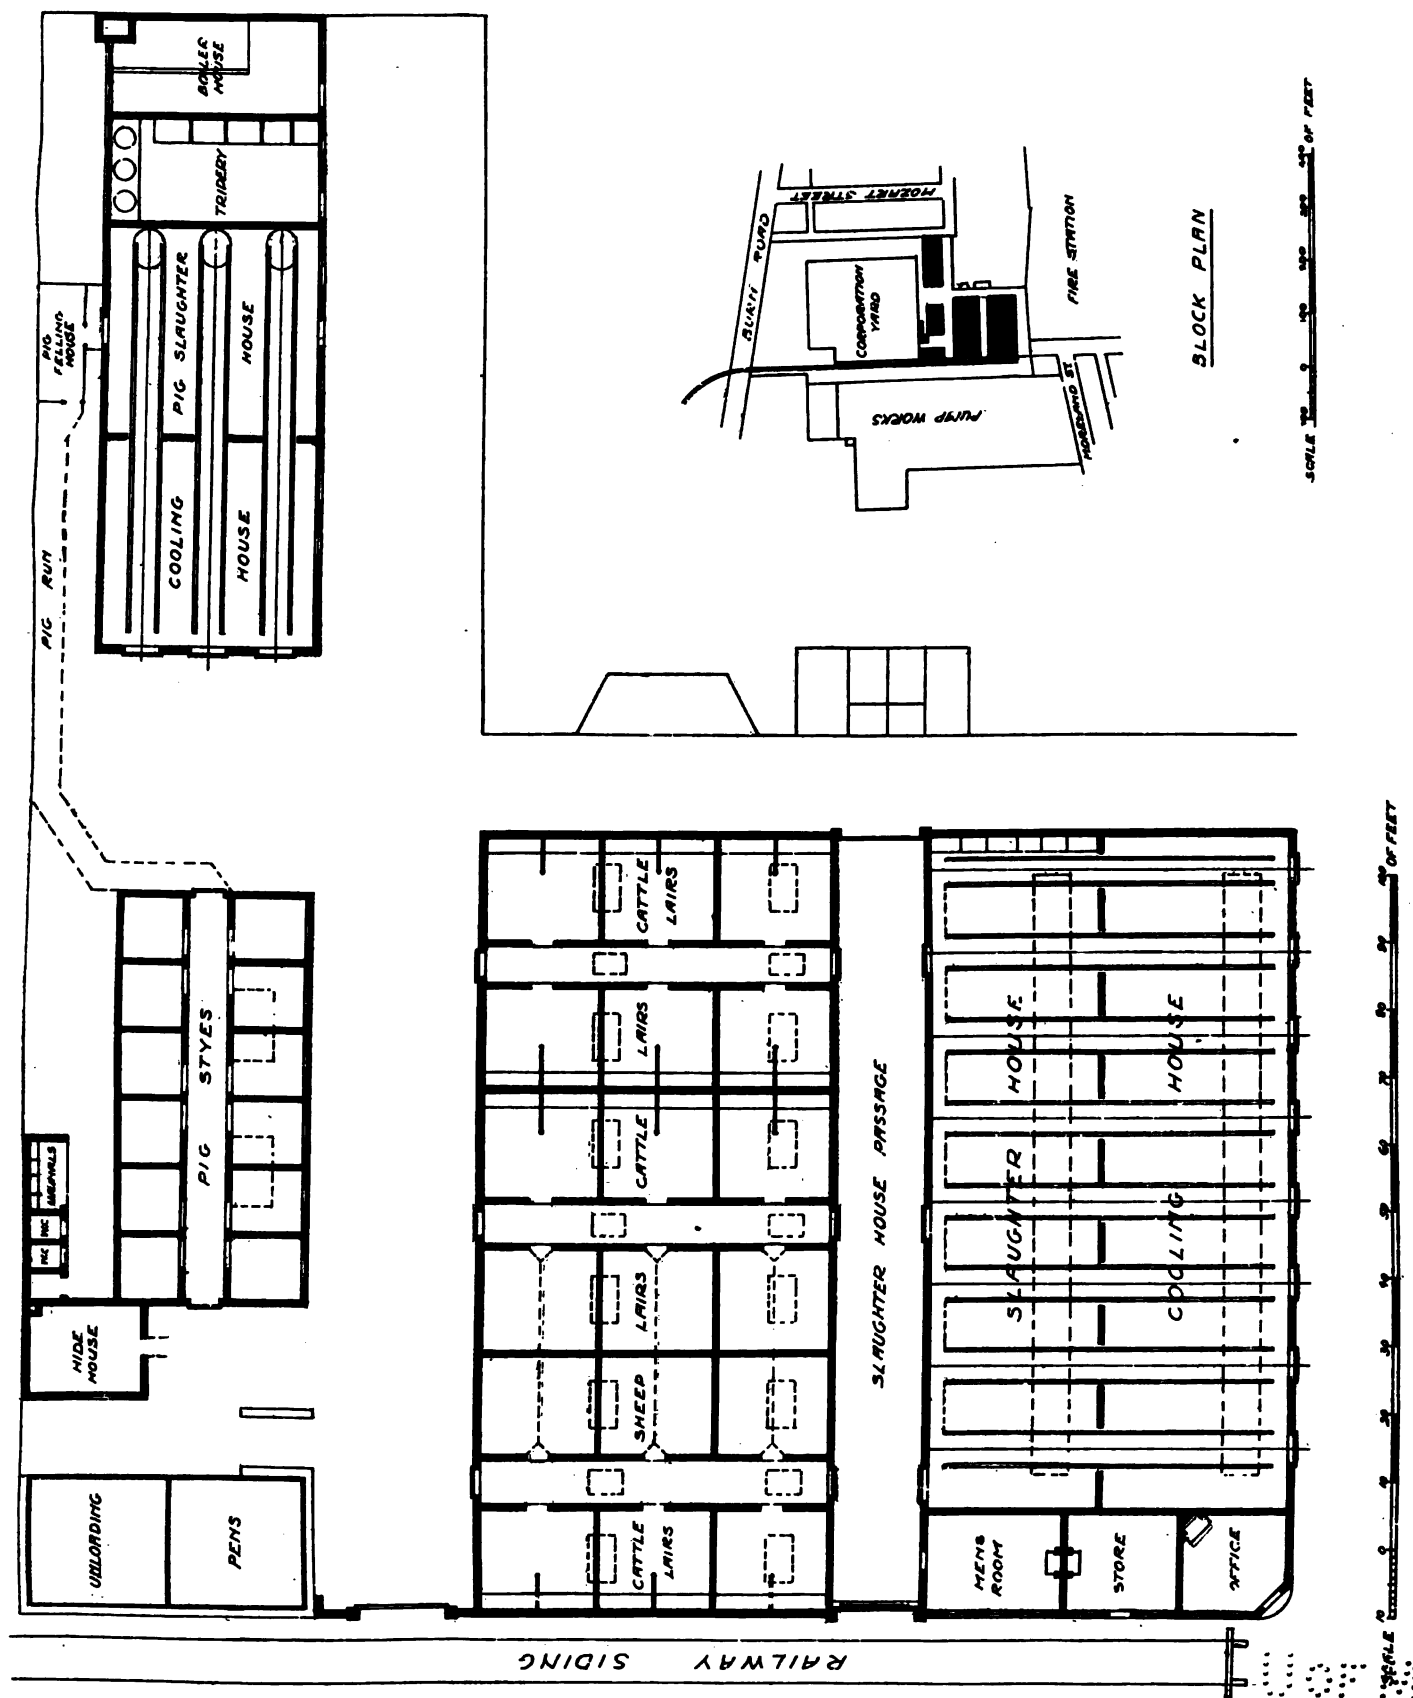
WEST HARTLEPOOL. BLOCK & GROUND FLOOR PLAN.
